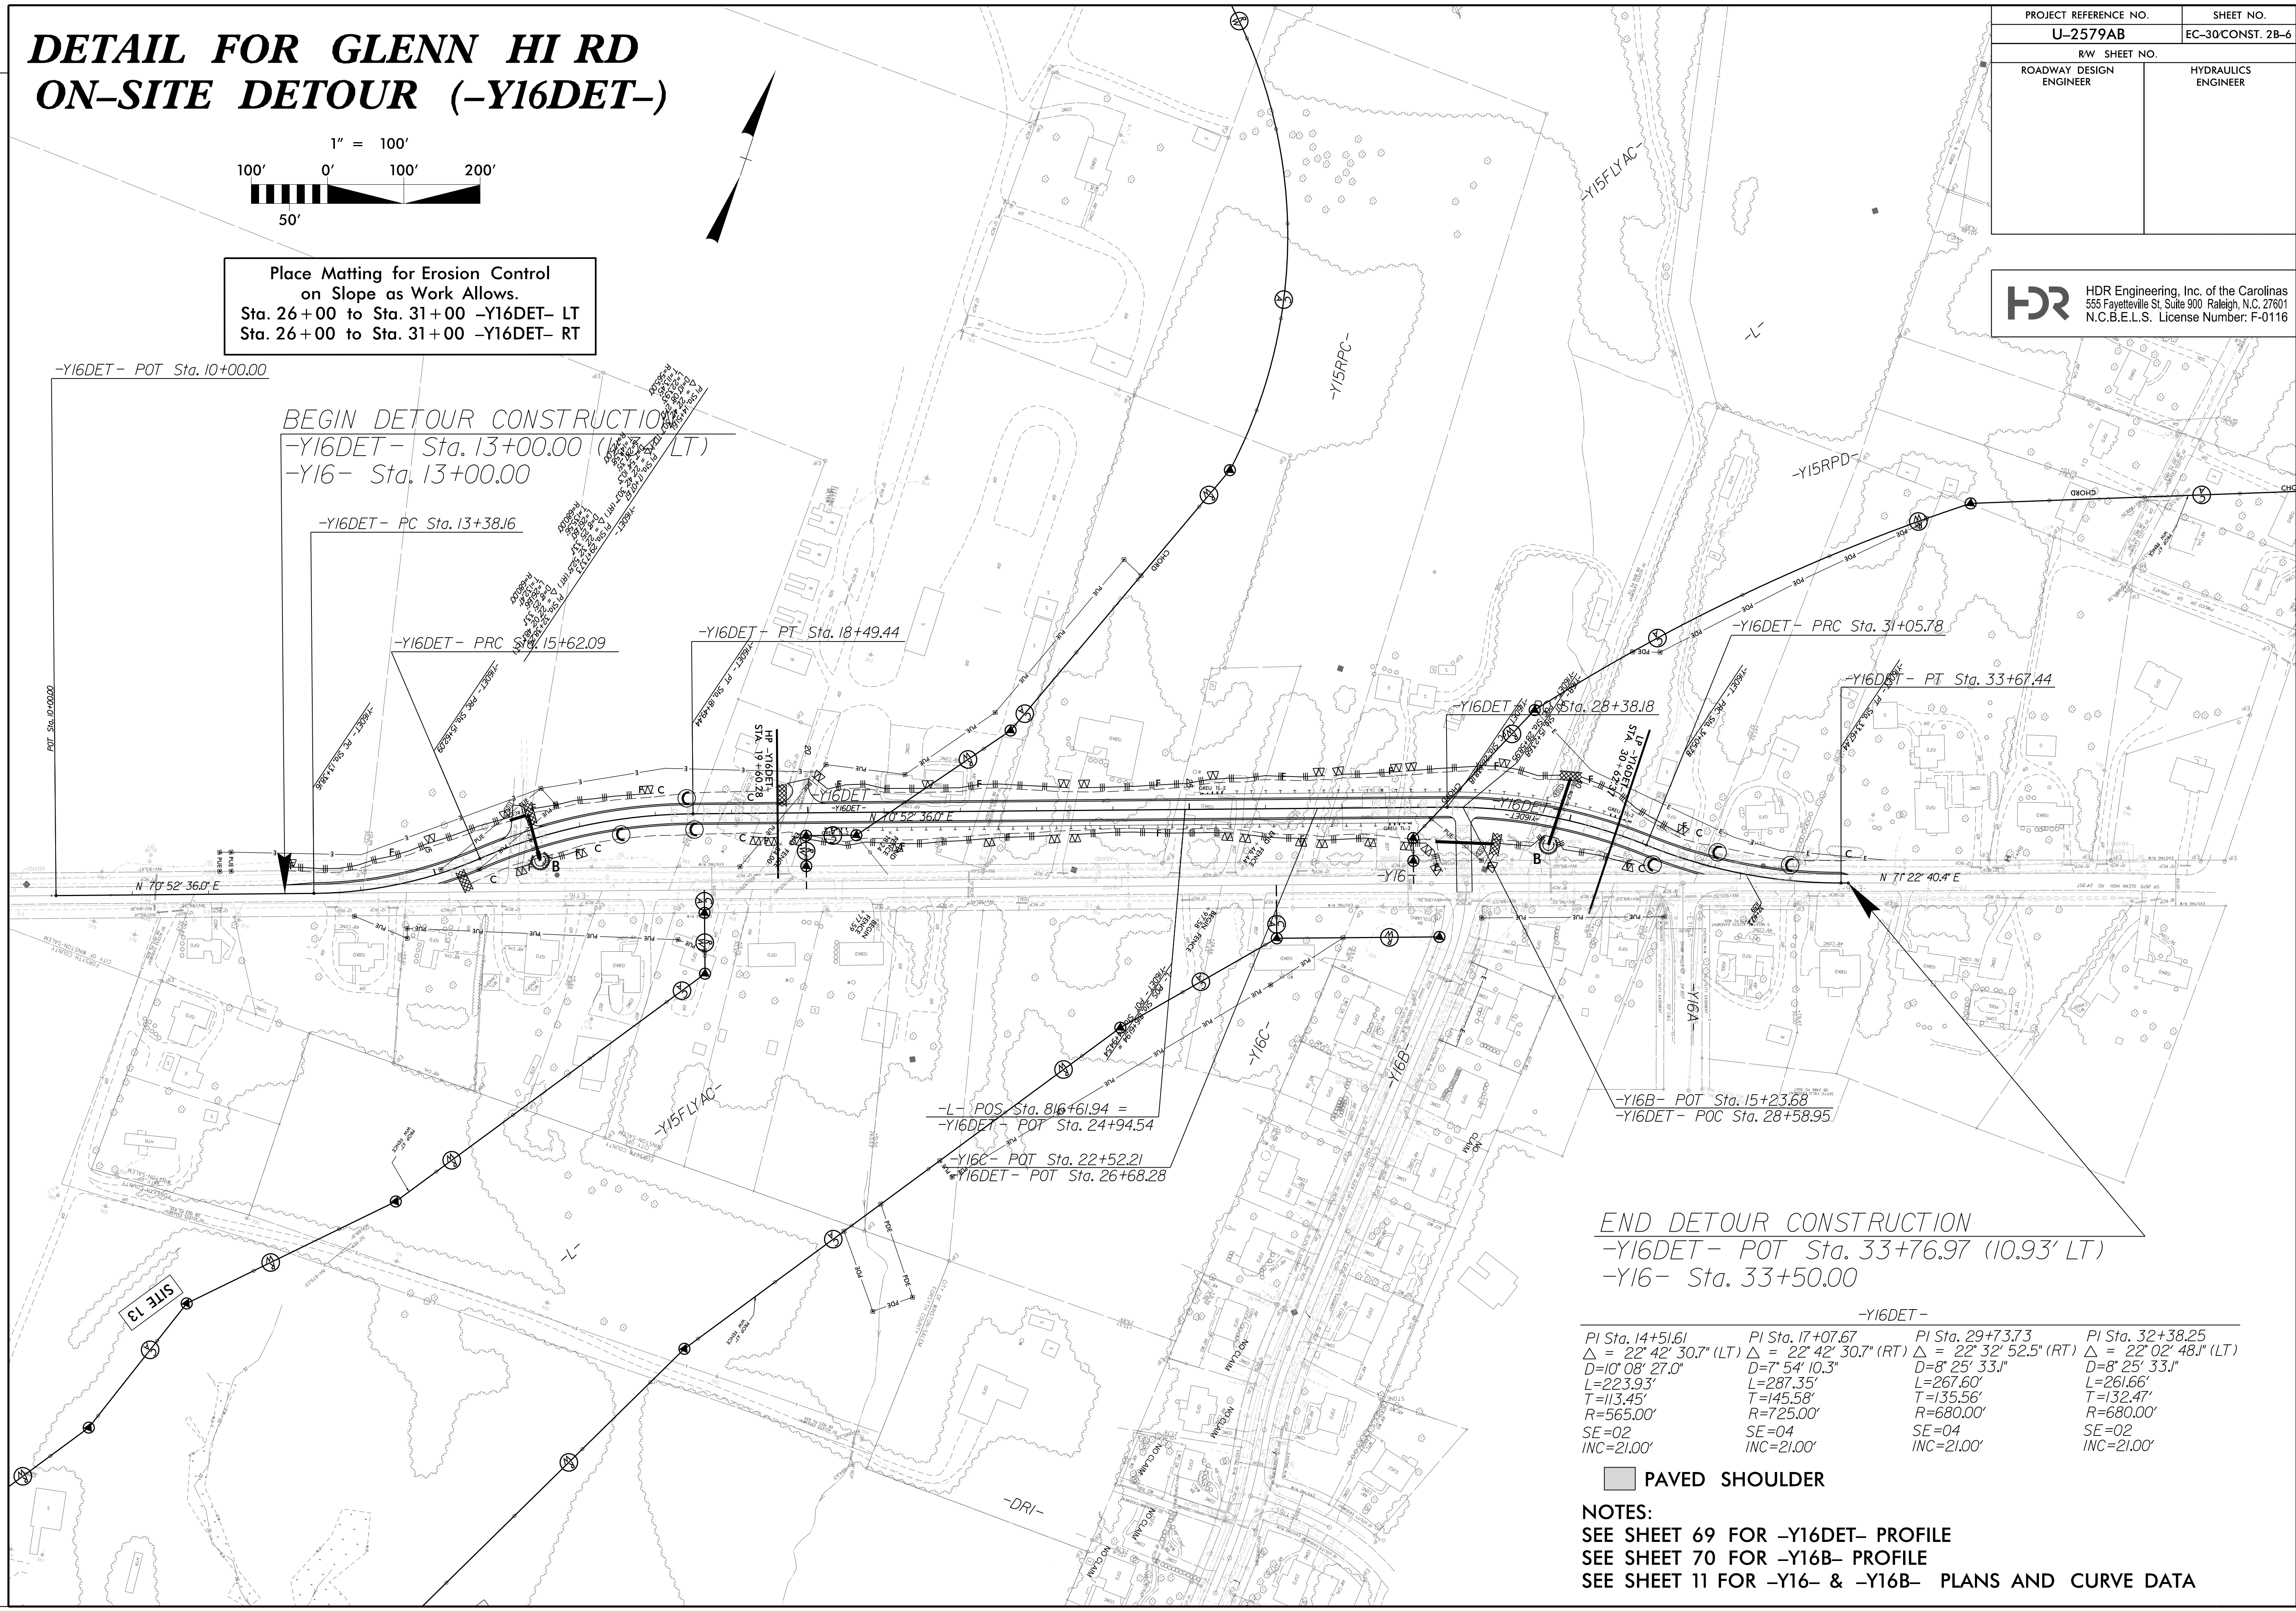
# DETAIL FOR GLENN HI RD ON-SITE DETOUR (-Y16DET-)
